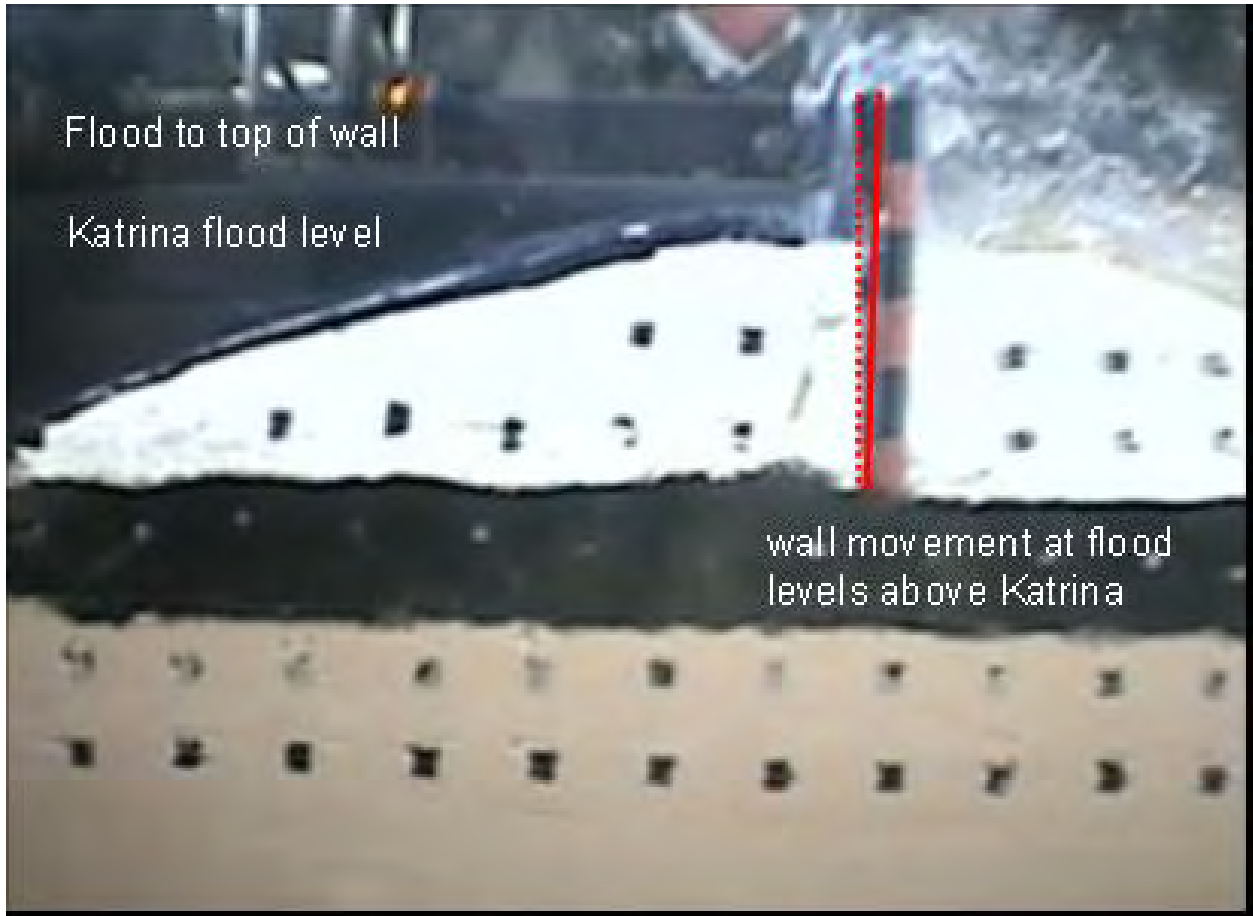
Crack forming at Orleans South levee section at flood level above Katrina
